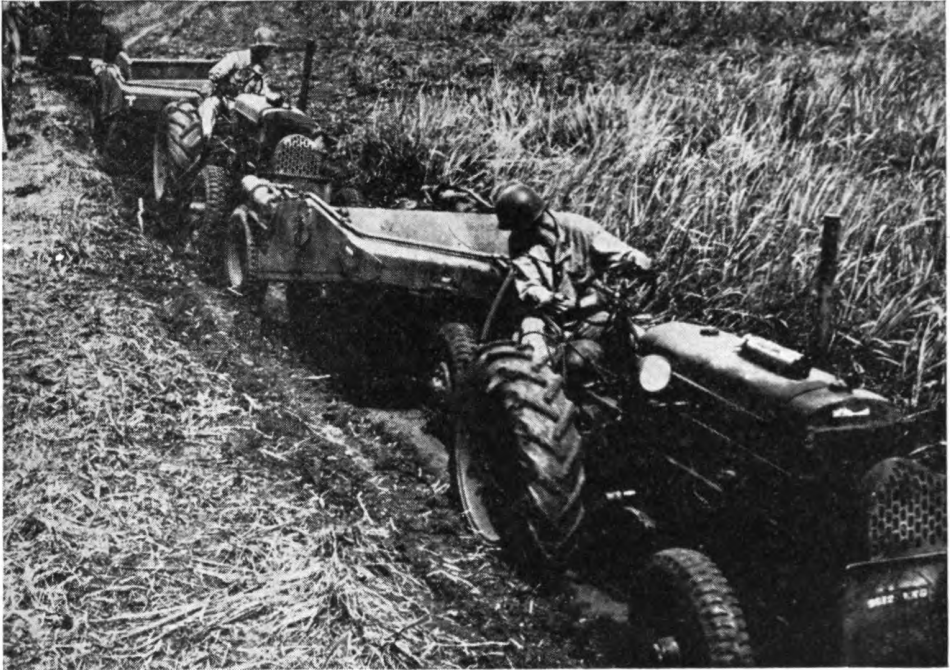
1½-cubic yard scrapers used to excavate ditch.
